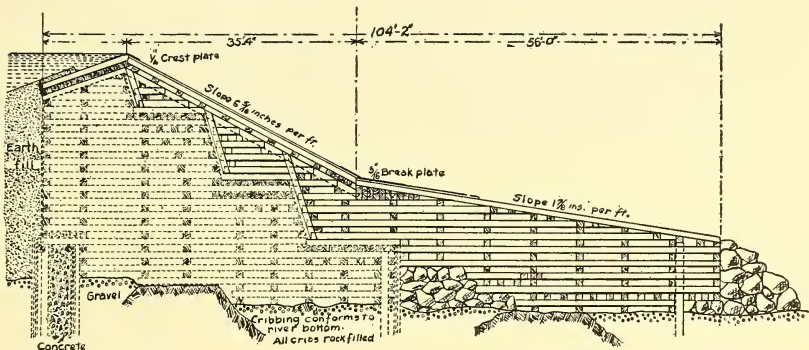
Section of Canyon Ferry Dam, Mont., as reconstructed.
